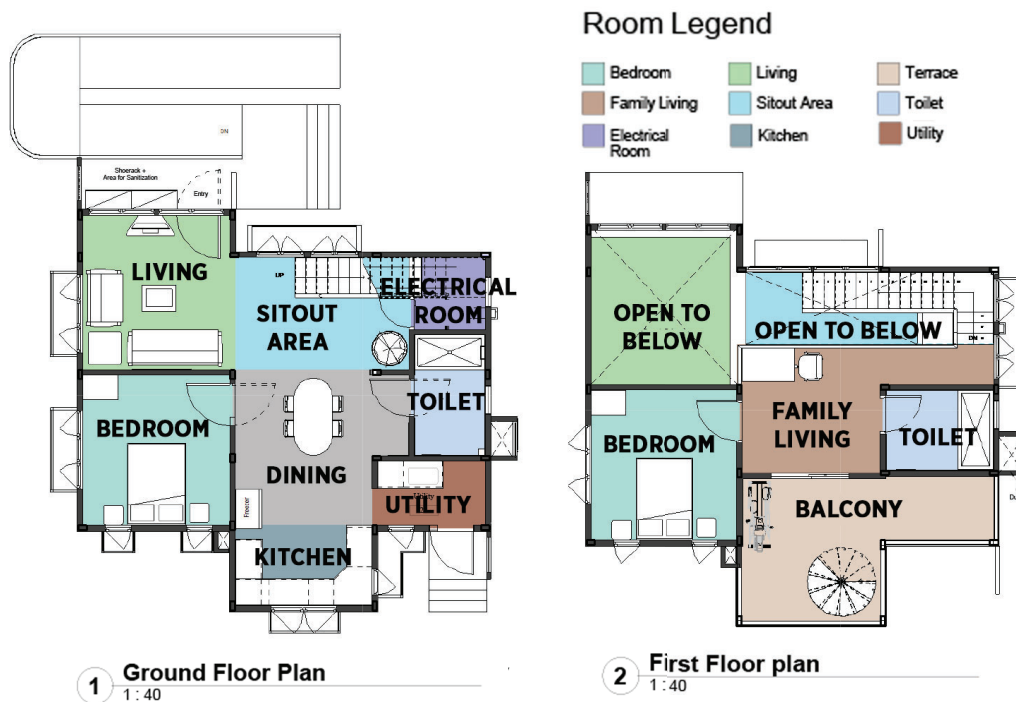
Floor plans of project Vivaan. (Credit: Ankan Karmakar)
